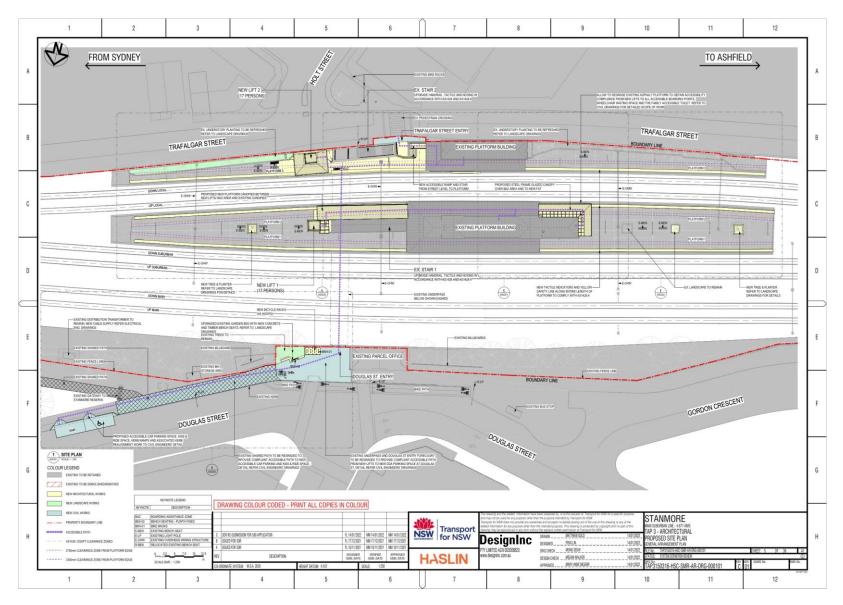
Proposed works site plan (Source: DesignInc, 2022)
